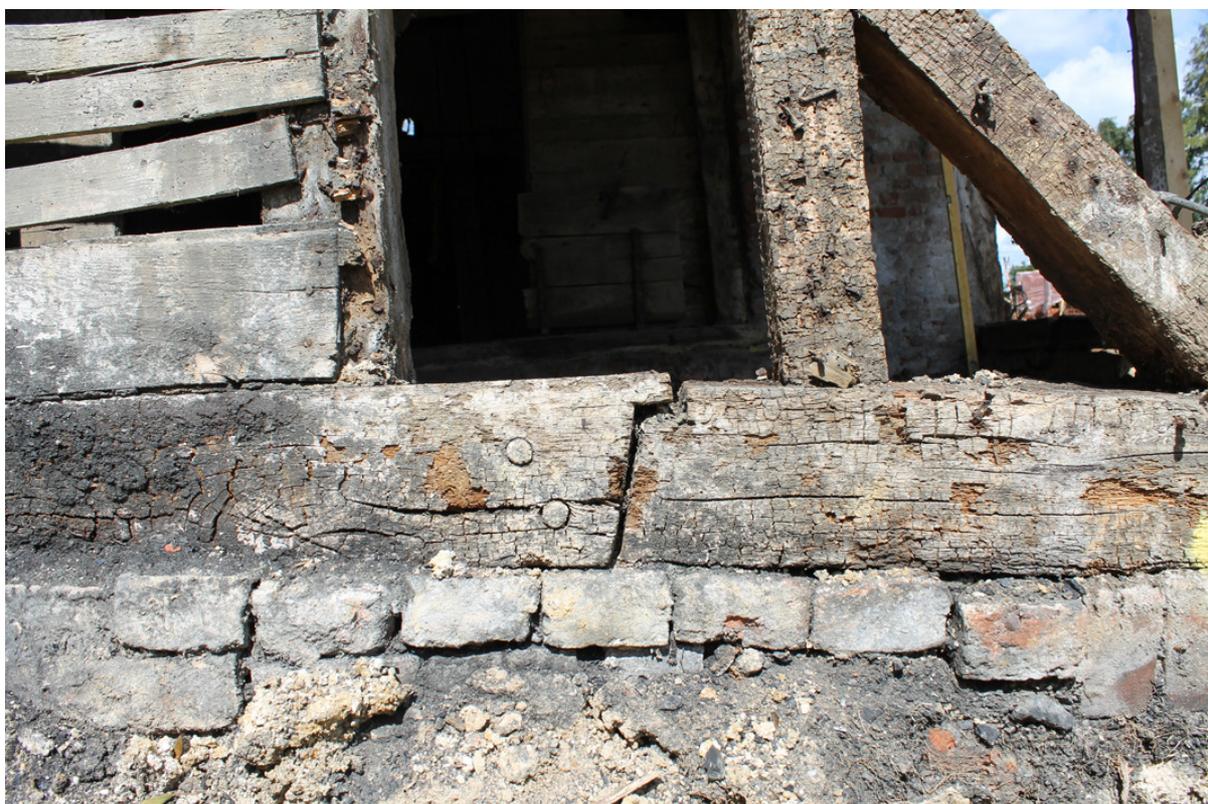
South side of bay two, upper register. Photo taken facing south.
